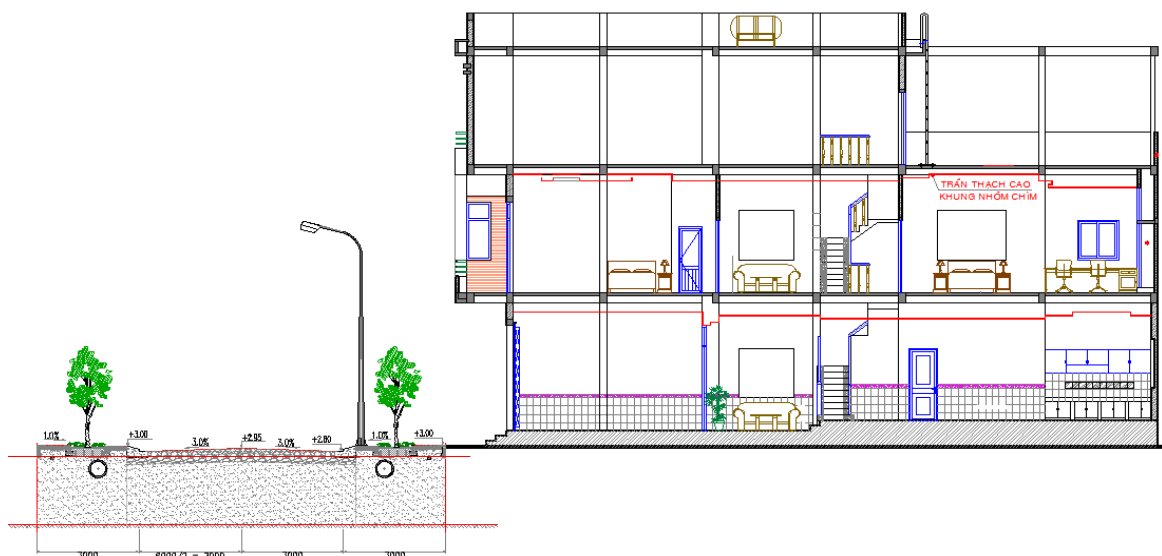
Typical example of street typology, setback and cross section of a terraced house
